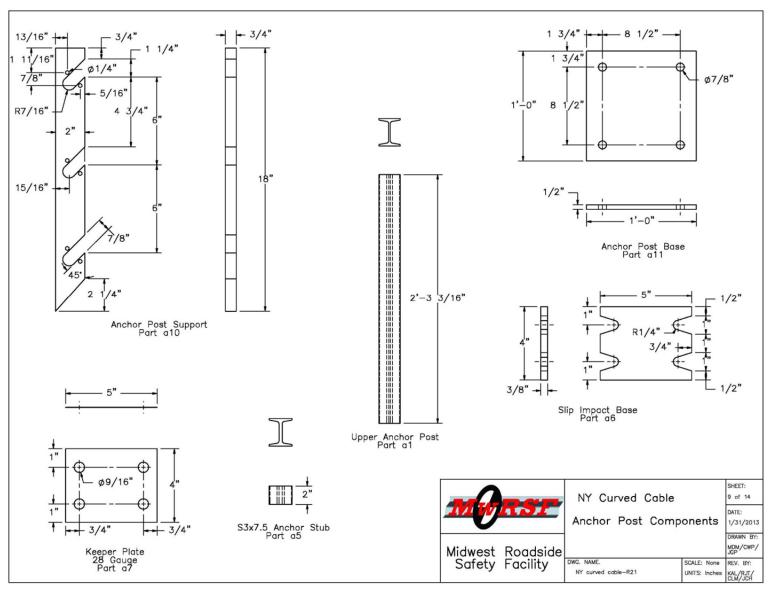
Anchor Post Component Details, Test No. NYCC-1
